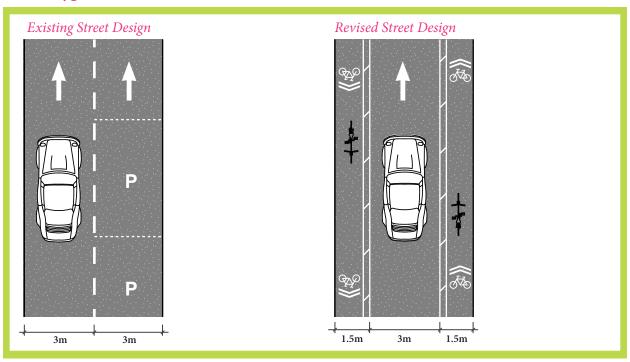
Street Design Revitalization; Street Type 3, plan
